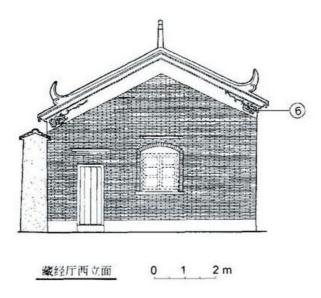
The west elevation drawing of gable wall of the hall in preserving Buddhist sutra in Huaisheng temple (1659).
